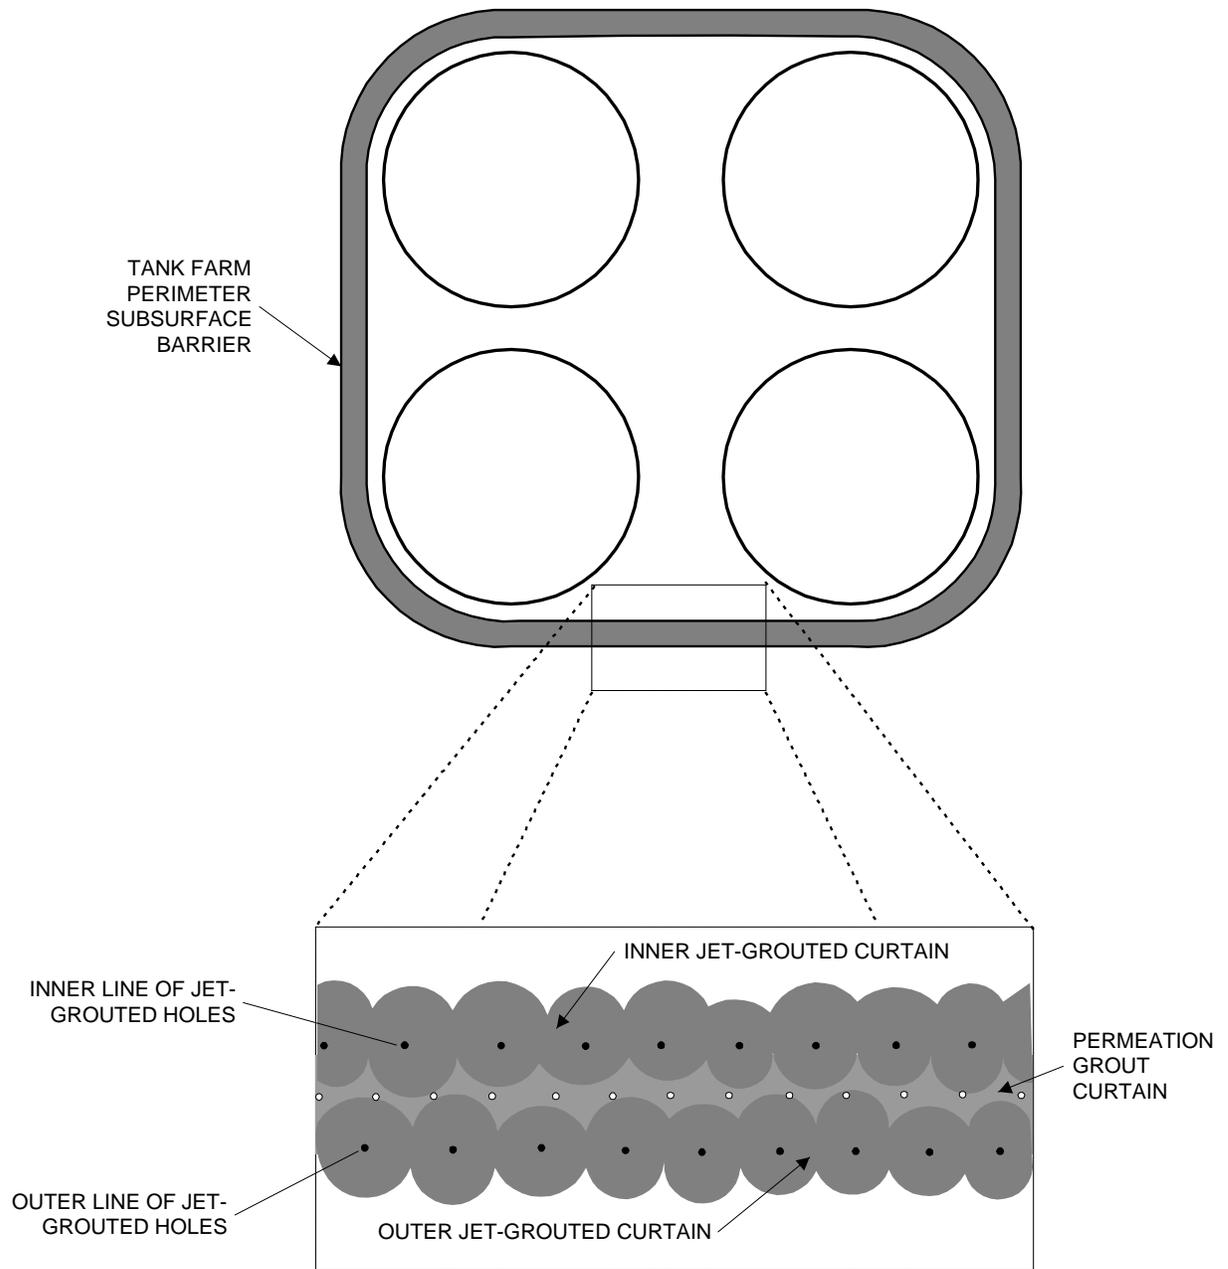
Standoff Vertical Barrier Constructed Around the AX Farm.
